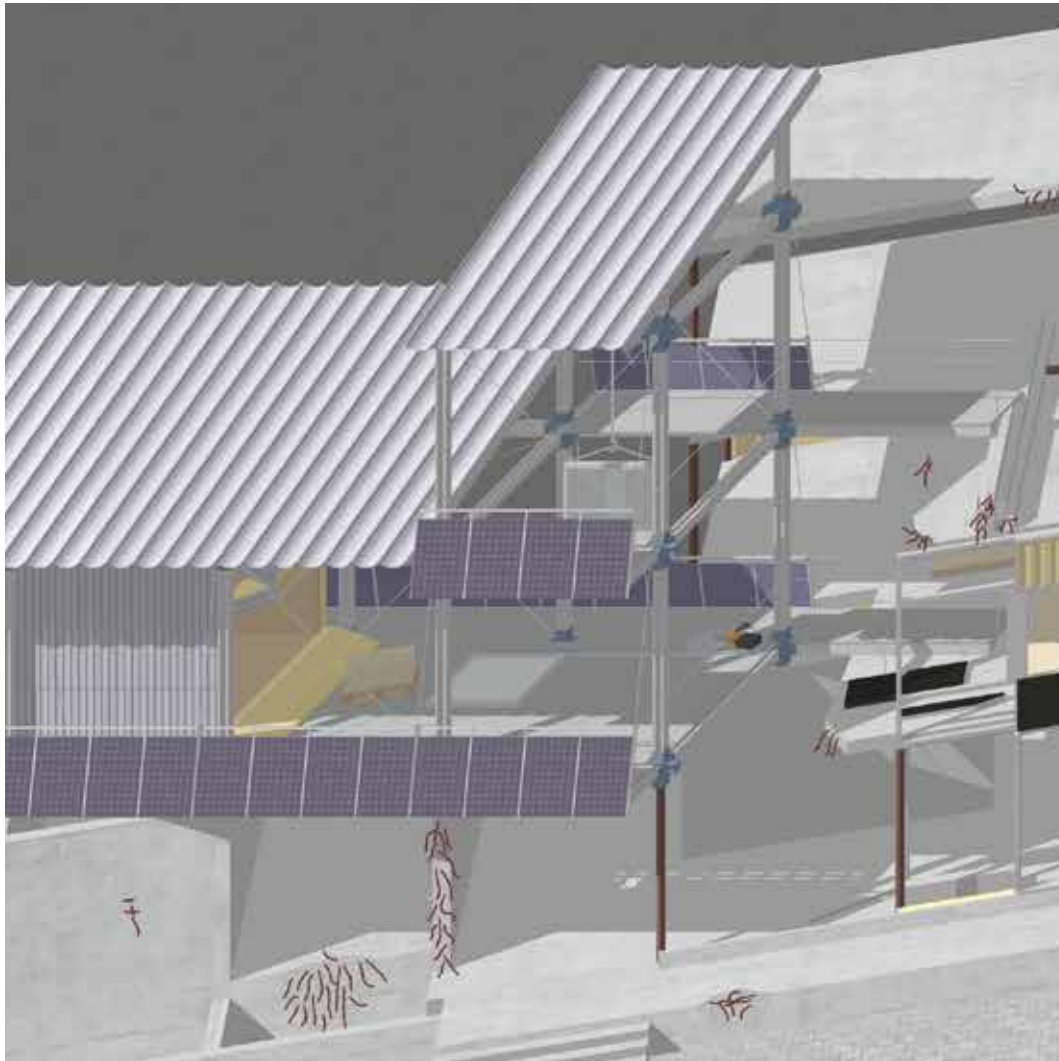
Design Proposal Reacts to Built Ground: Concrete/Brick Building
